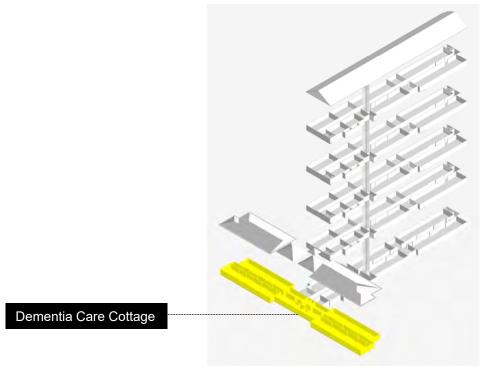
Spatial Configuration between Dementia Care Cottages and other Parts of Wainwright Building
